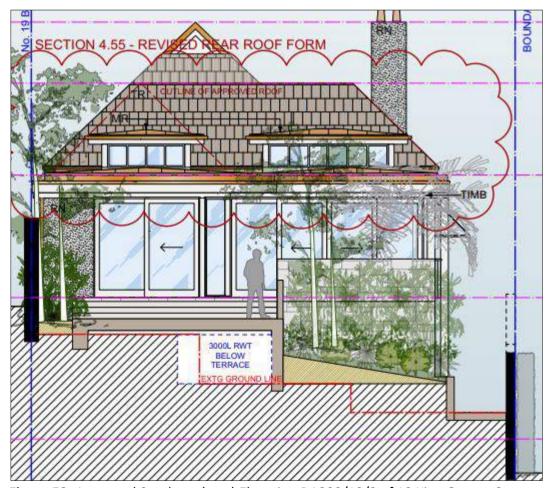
Approved Southern (rear) Elevation DA300/19/2 of 19 King George Street.
